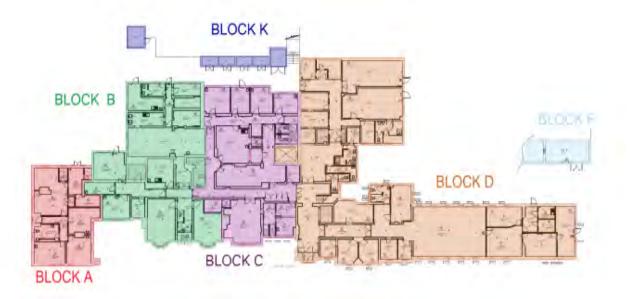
LWH 6 Facet Survey Ground Floor Plan
